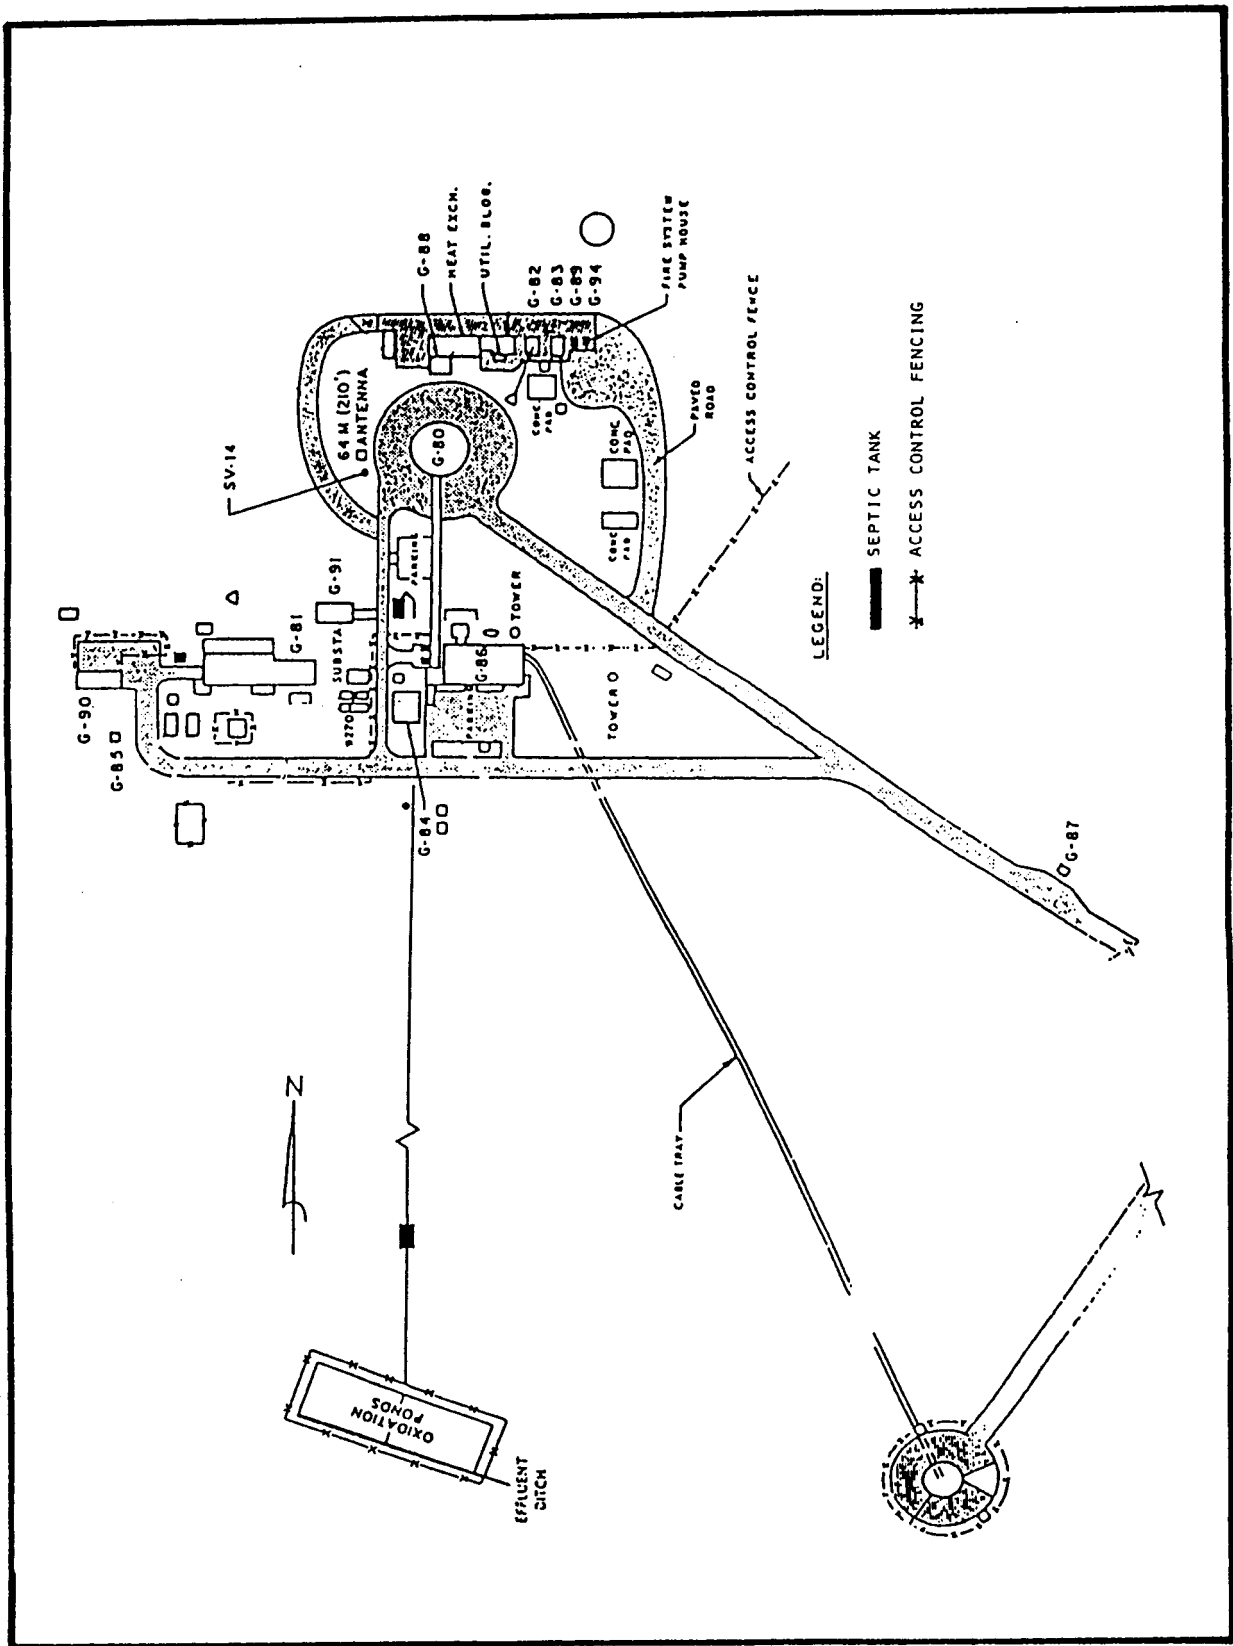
Location of Septic Tank System and Oxidation Ponds at Mars Site
